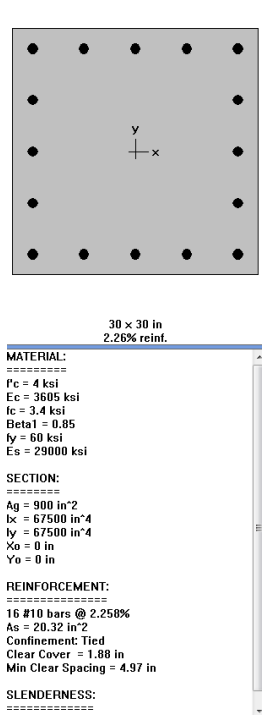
Design of interior column line E columns (shaded purple above) in spColumn.
